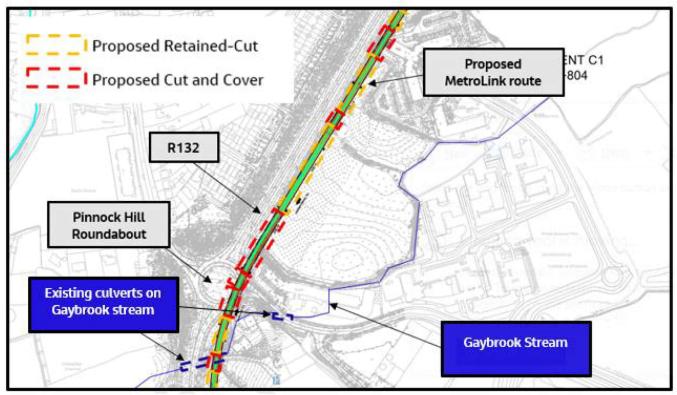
Existing culvert crossing on Gaybrook watercourse (Ch. 4 + 500).
